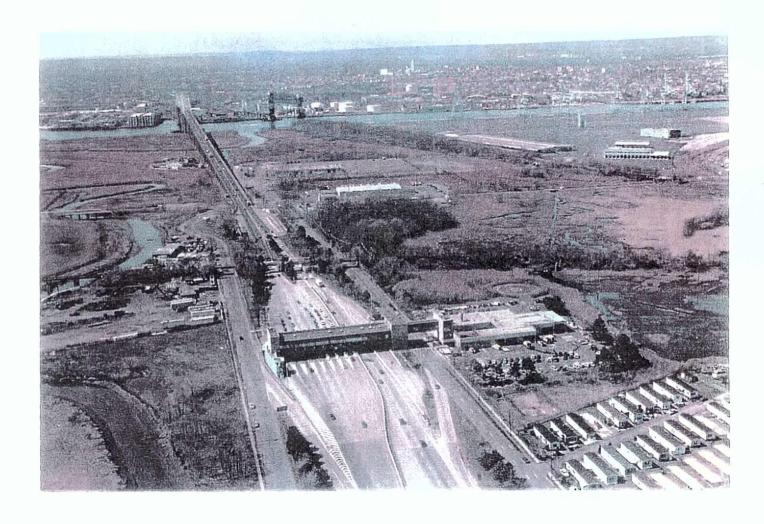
Aerial view west toward the Goethals Bridge. The toll plaza is in the center-foreground. The Travis Branch is just to the west (above) the toll plaza. The Arlington Yard study area is seen in the right of the photograph. Note the Bridge Creek running through the marsh and an empty Howland Hook Marine terminal in the top right of the photograph (c.1995 Port Authority photograph).
